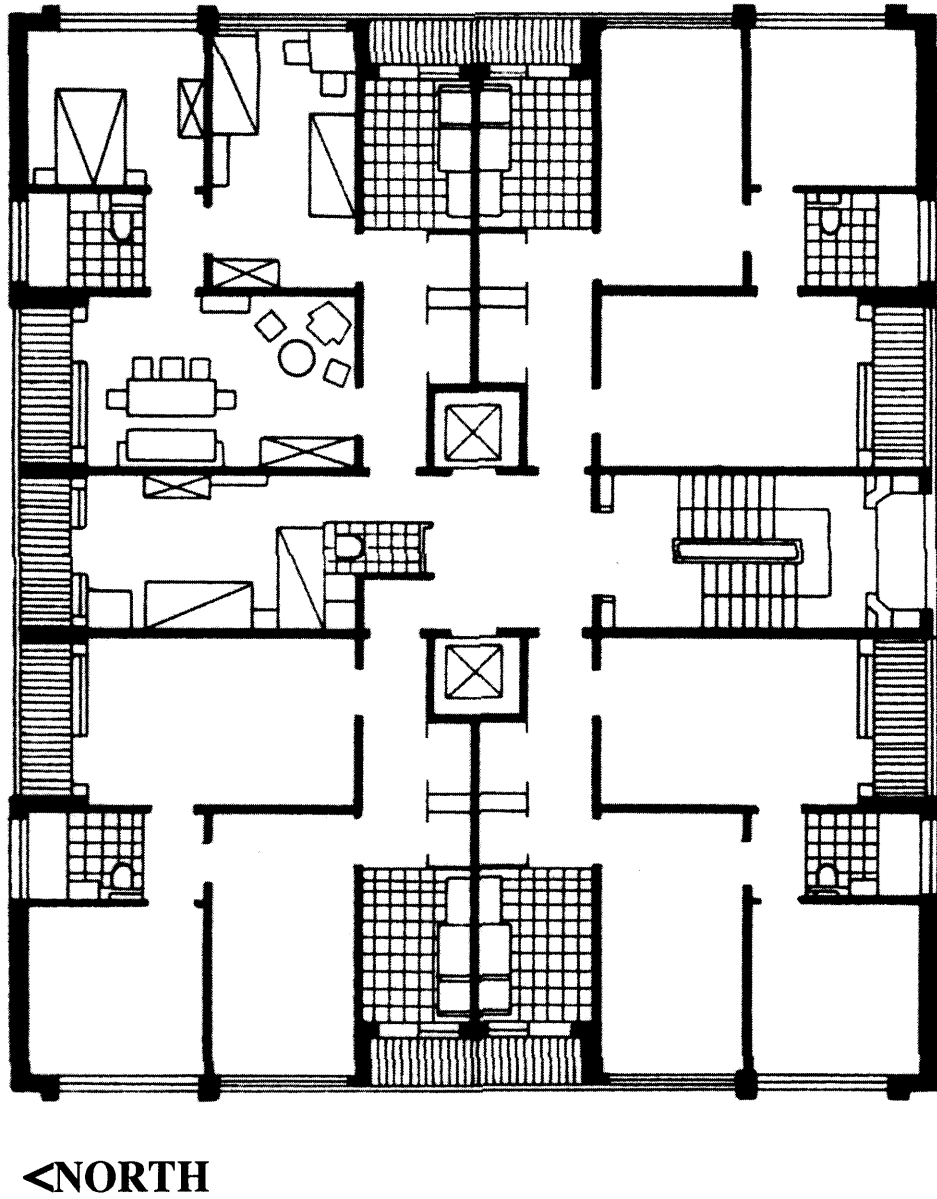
Standard floor plan of the Floreasca towers. From *Arhitectura* 3, 1963, p. 20.
